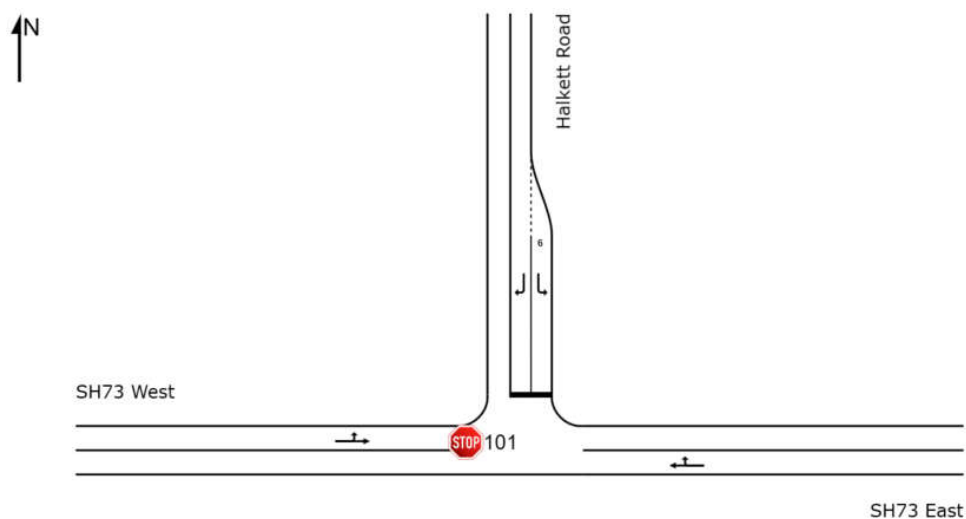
Existing SH73 / Halkett Road Intersection Modelled in SIDRA
